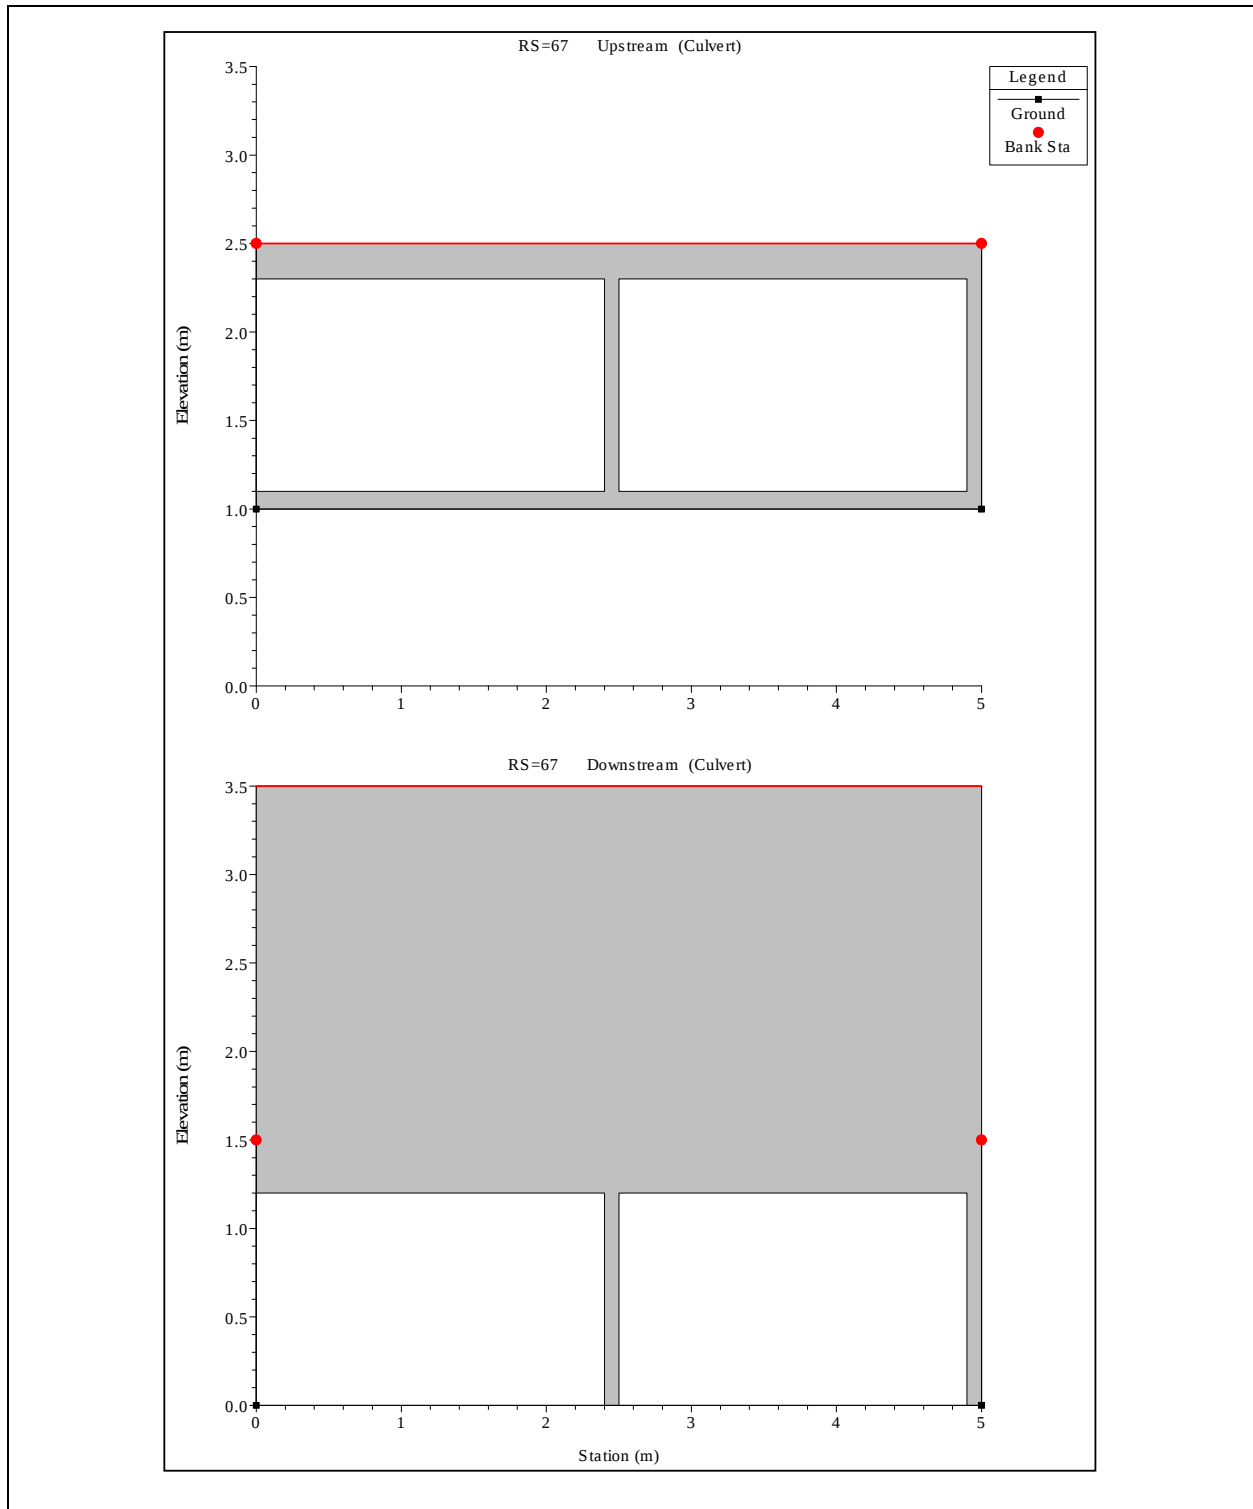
Cross-section of the Blocked Drainage structures (Shows the Existing Configuration with a Higher Headwall)
